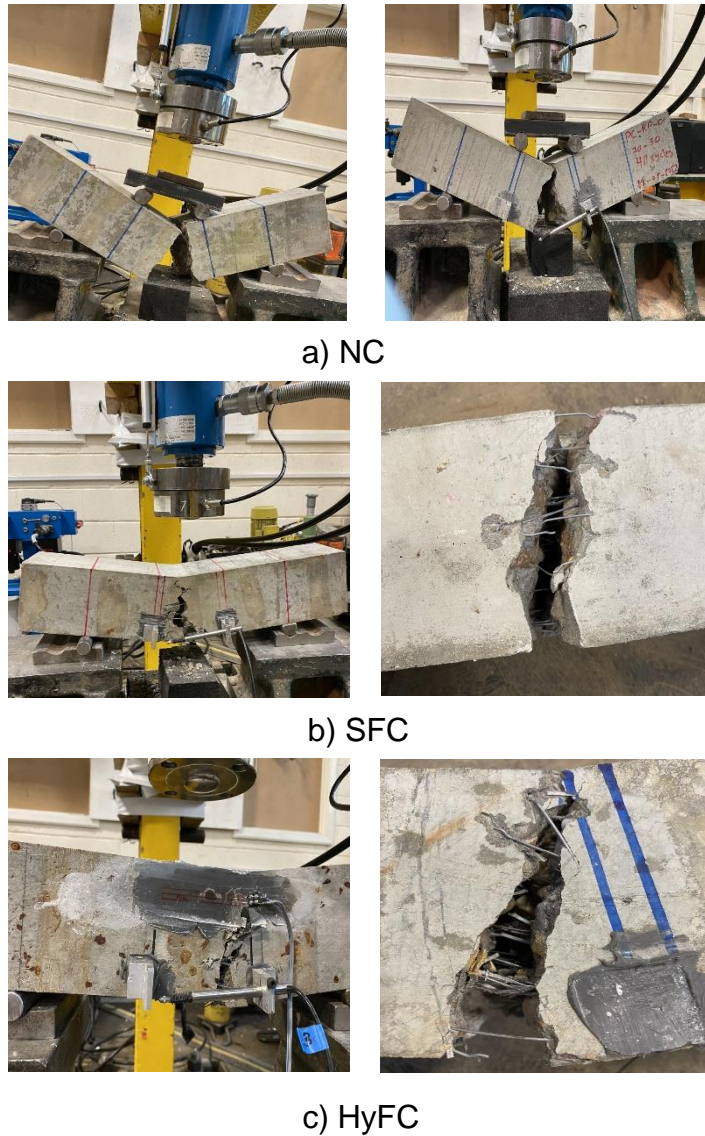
Crack pattern and mode of failure for normal and fibre concrete beams
